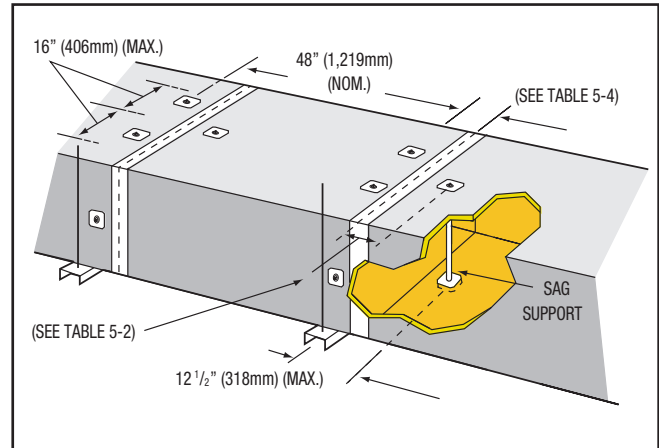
B. Tie Rod Reinforcement, 24" (610mm) Centers, 48" (1,219mm) Duct Modules
